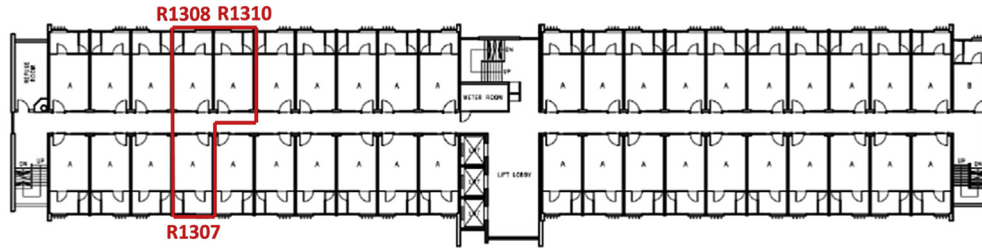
Schematic diagram of the building plan and location of rented flats.
